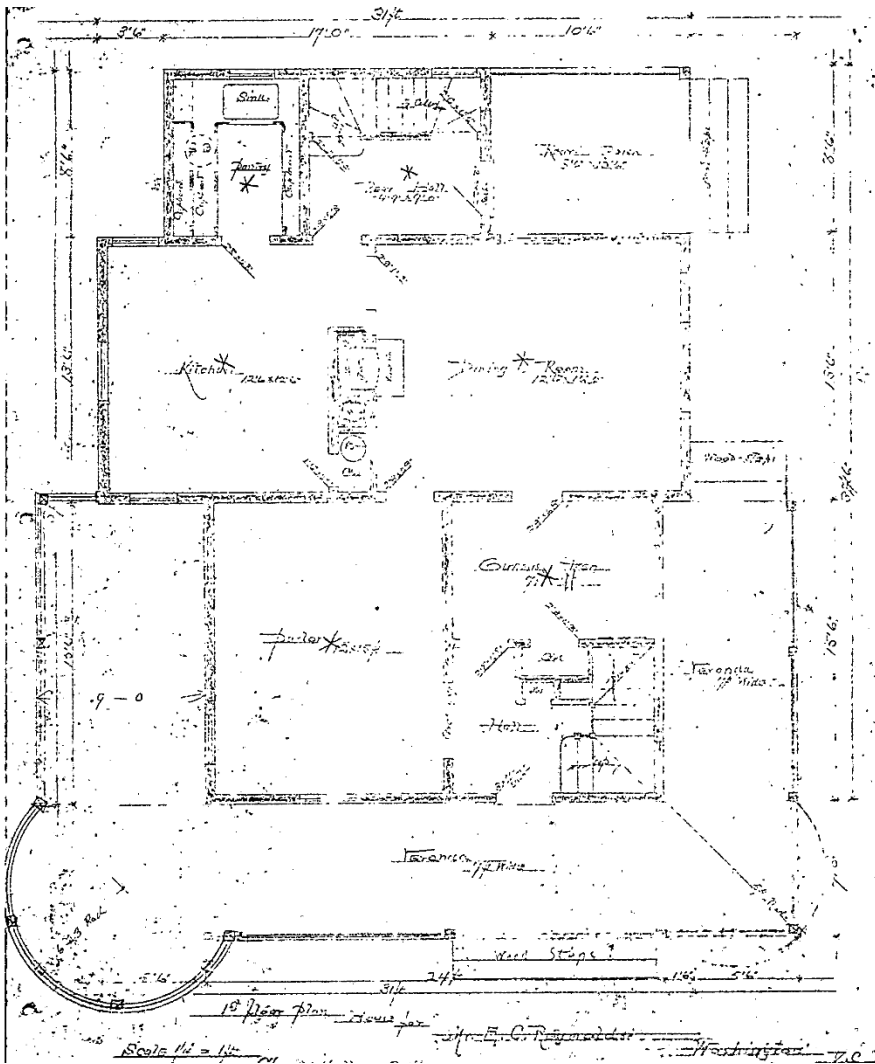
First floor plan of the Edwin and Julia Reynolds House.
